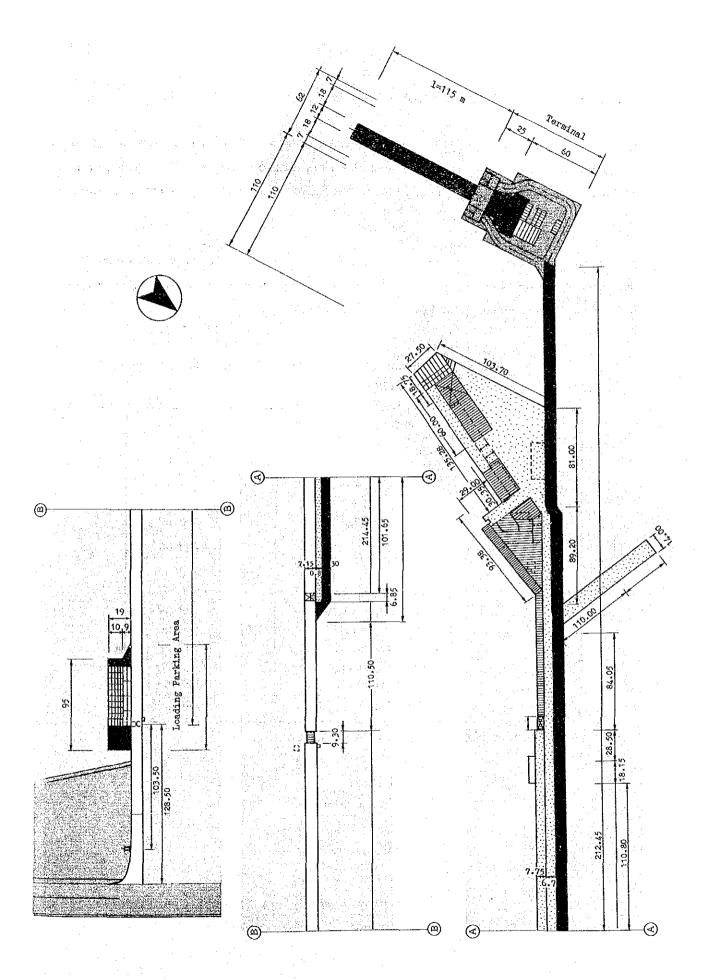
Long Term Ro/Ro Terminal Plan of Port of Bacolod
